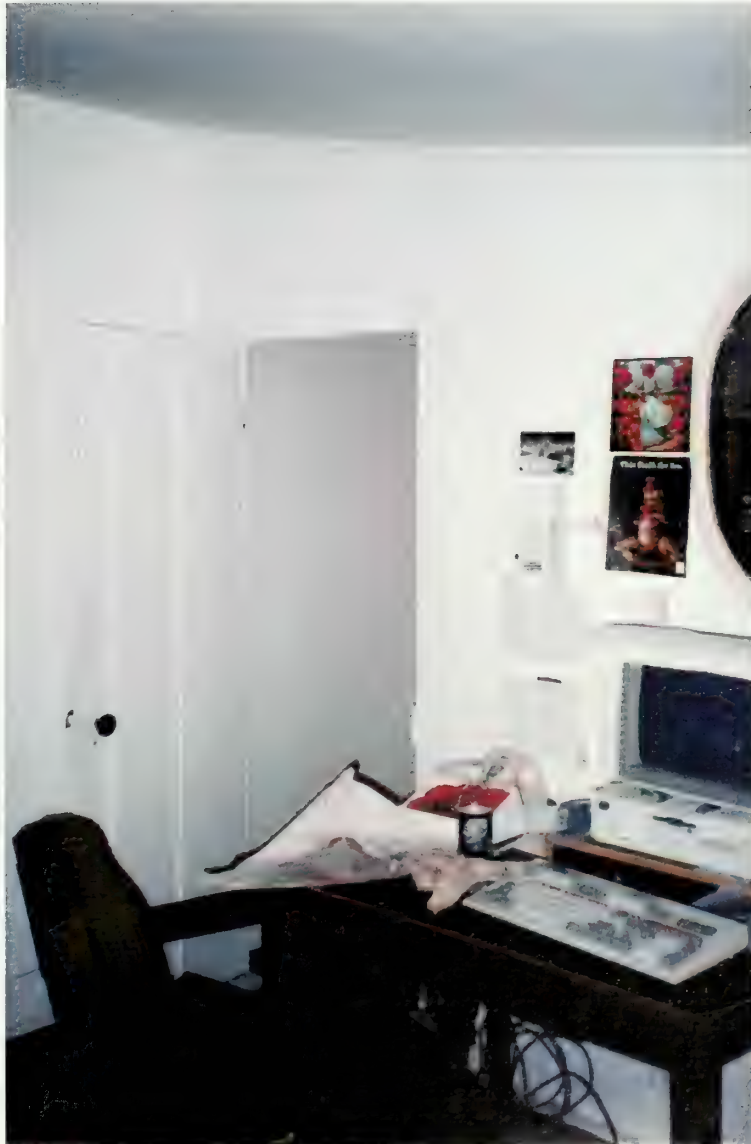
View looking to the south in room 207. Most of the wall surfaces in this room are plaster on wood lath. This view shows the doorway into room 208 and the back side of the only board and batten partition between two rooms.
